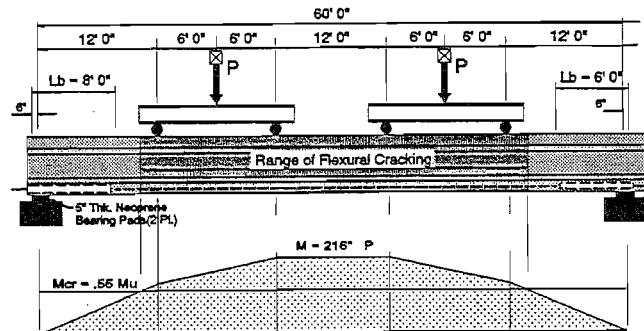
Symmetrical Loading Arrangement with 60' Span
